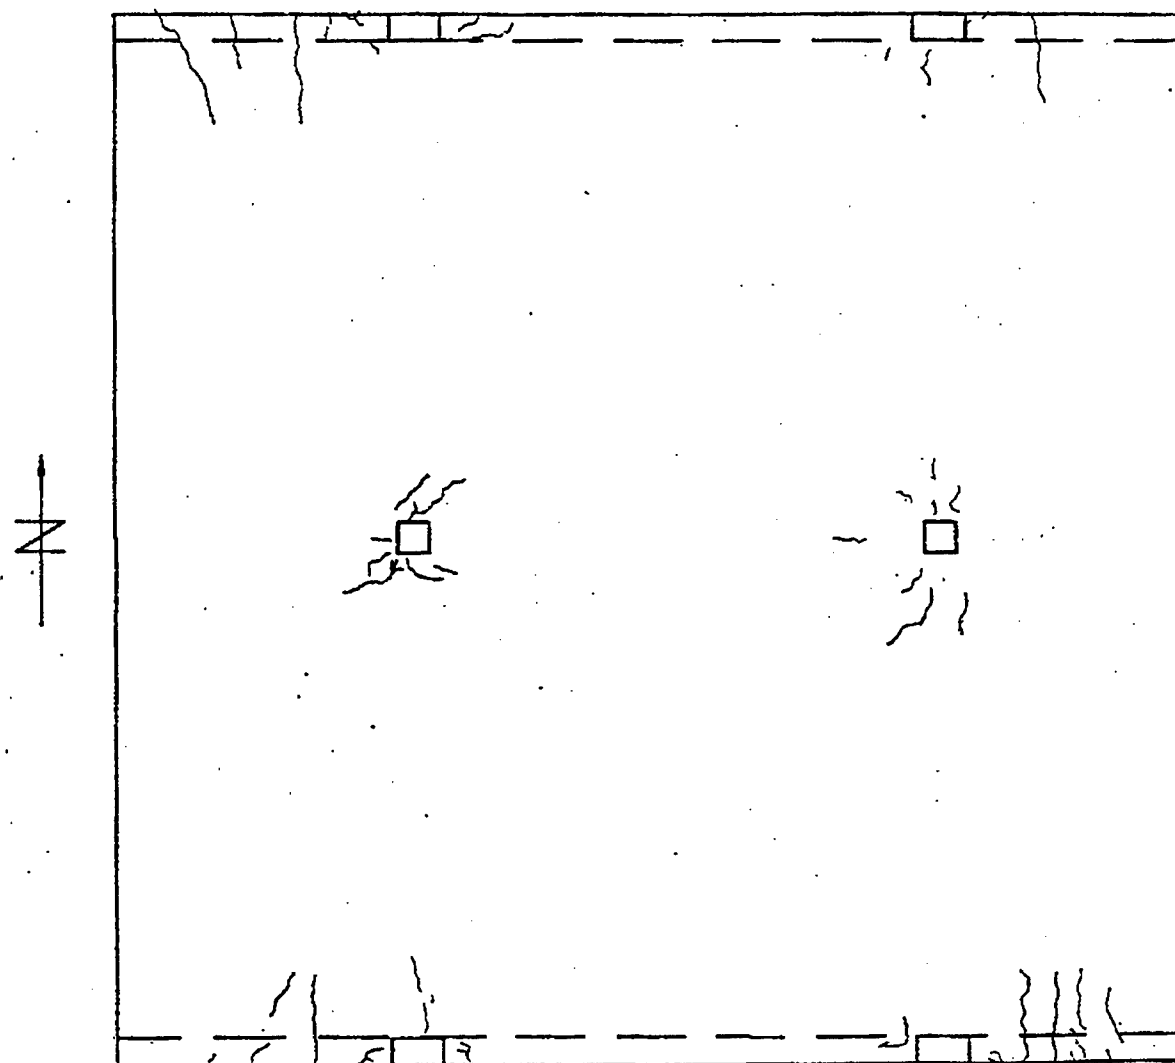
Crack Pattern, First Floor Slab, Top Side, Post-T420DL
